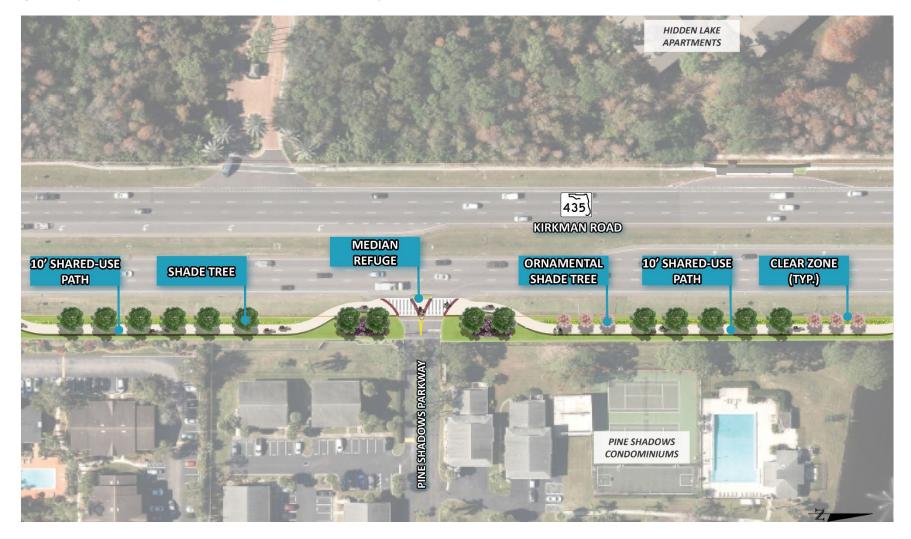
| Kirkman Road Trail at Pine Shadows Parkway Rendering
